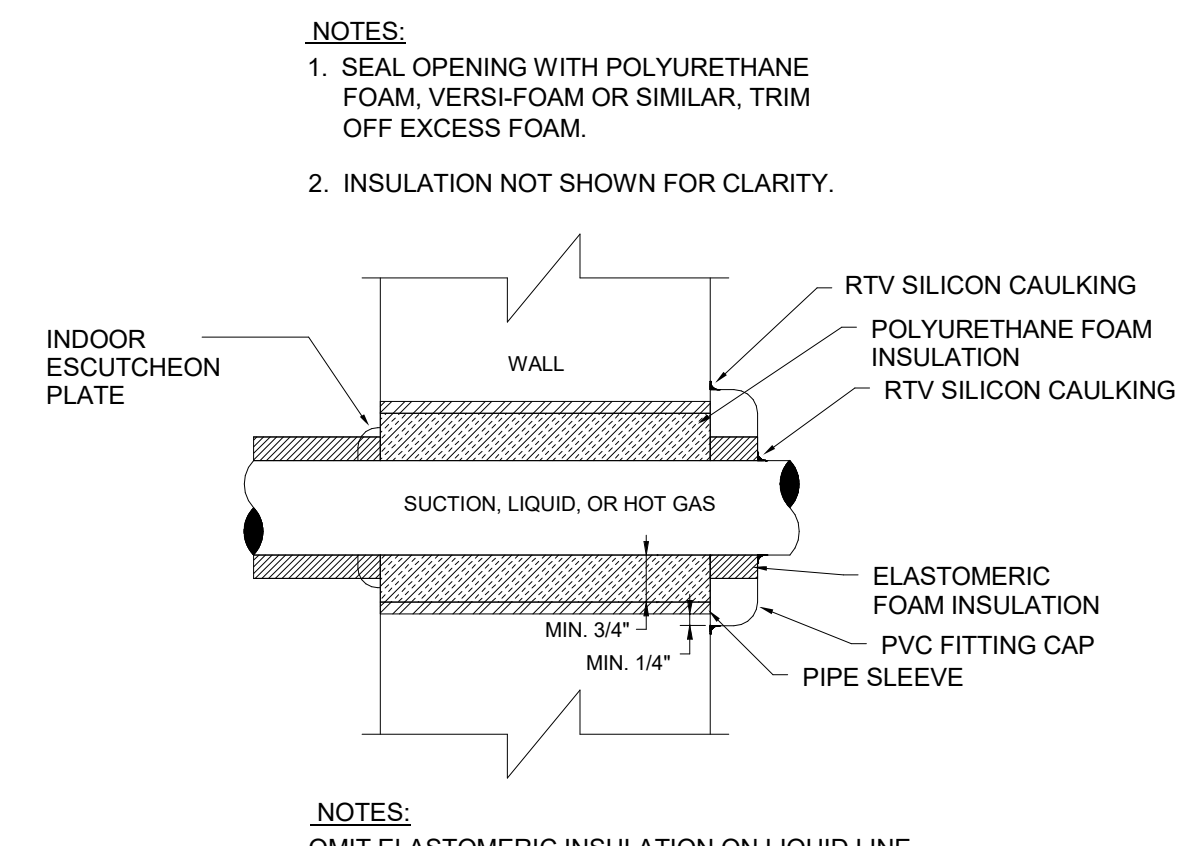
DETAIL BASED ON DIVERSITECH MODEL QSWB2000M-1
